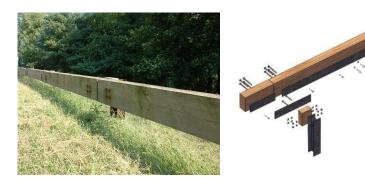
Merritt Parkway Guide Rail/Steel-Backed Timber Rail
